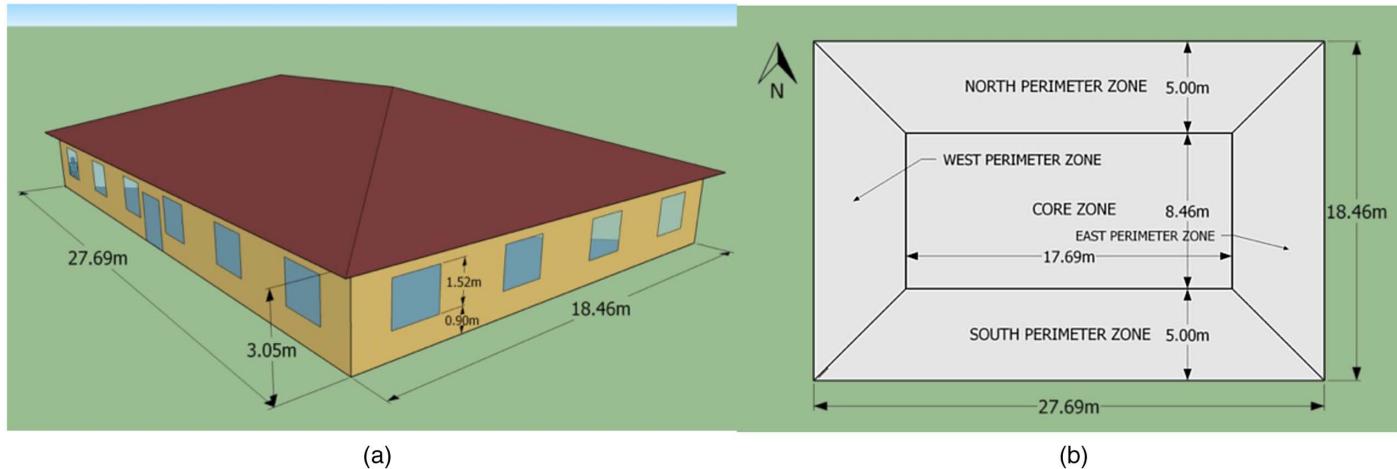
Overall geometry of the reference building model: (a) three-dimensional exterior view; and (b) plan layout of a typical floor.
